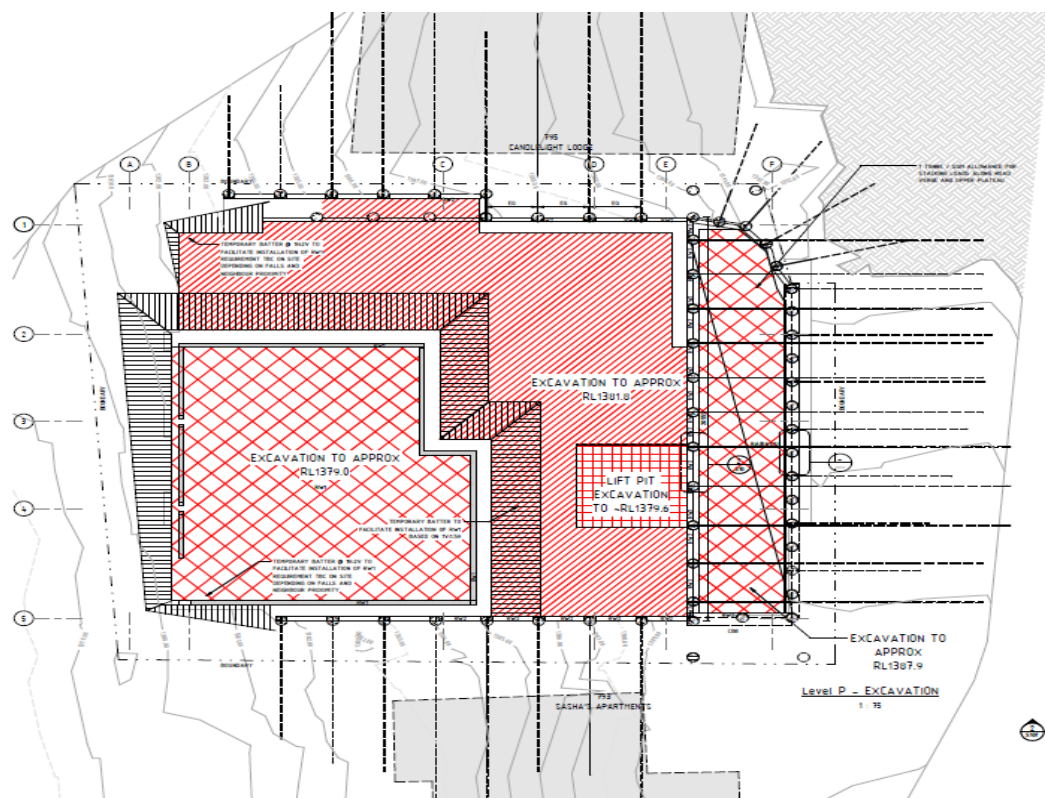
| Extent of temporary ground anchors, proposed and installed (Source: Applicant's documentation)
